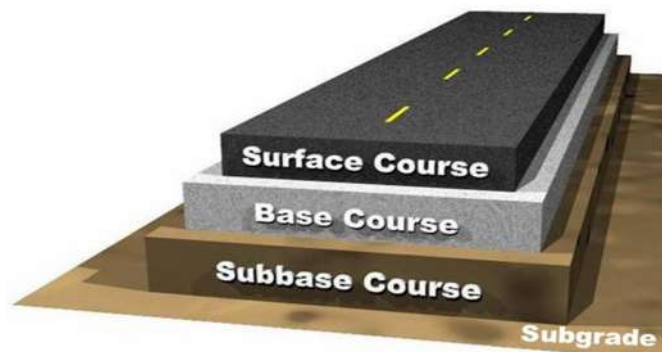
Basic flexible pavement structure (Lanham, 2006)
